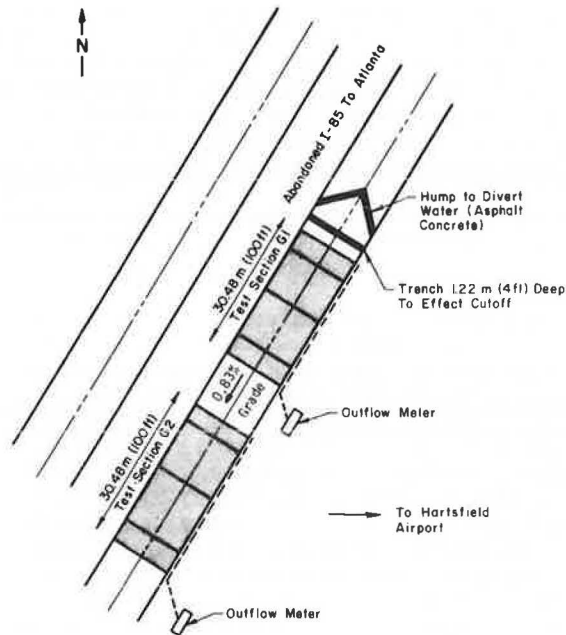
Subdrainage system constructed at test sections G1 and G2.
